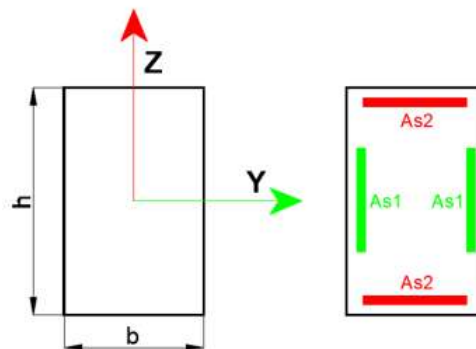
Column local axes and longitudinal reinforcement layout.
